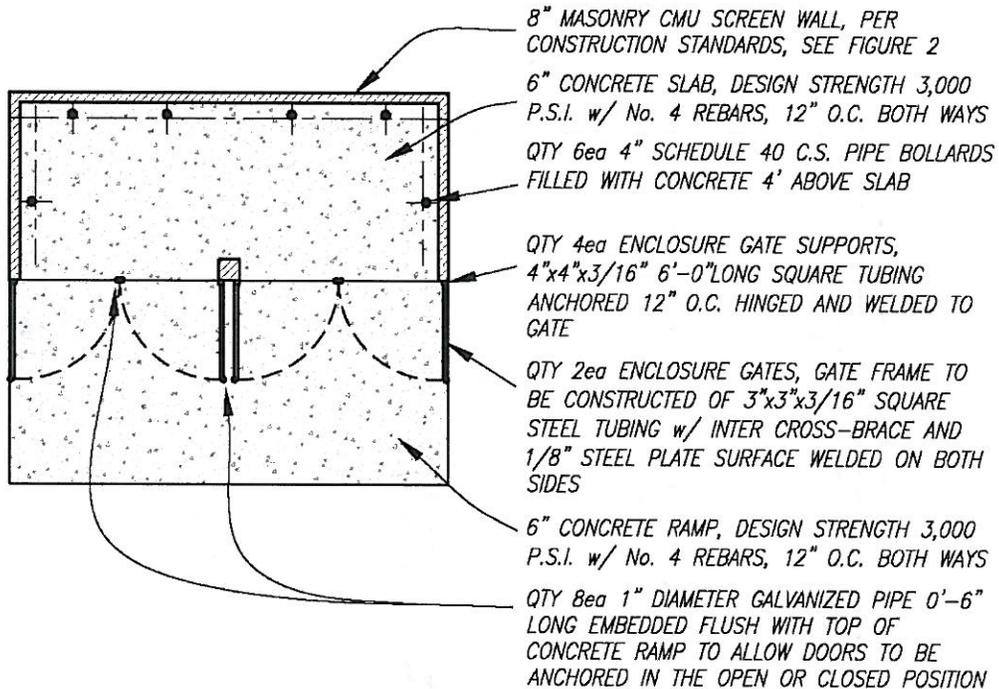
A - PAGE 1 of 2 - DIMENSION PLAN
